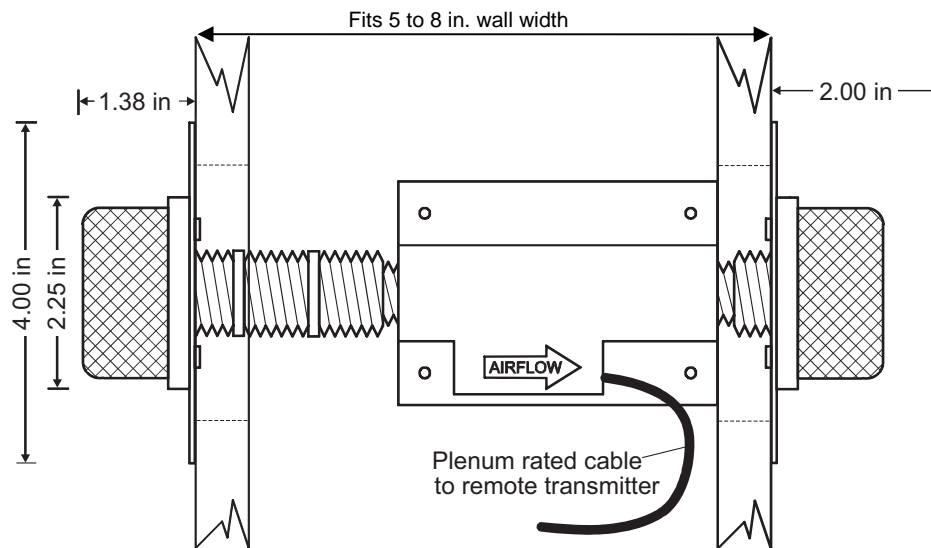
Typical Application, Bleed Airflow Sensor and Wall Mount Installation Kit
